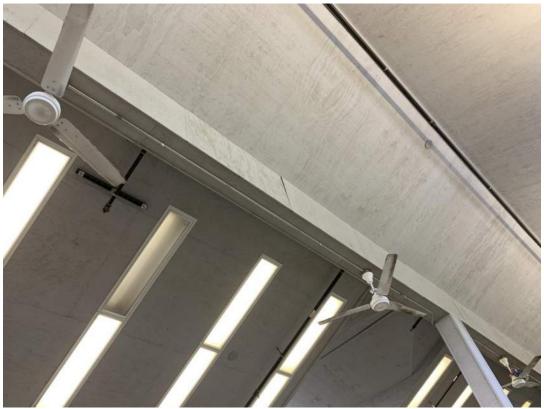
S70: Main Room (Ceiling Panel Deflection)
